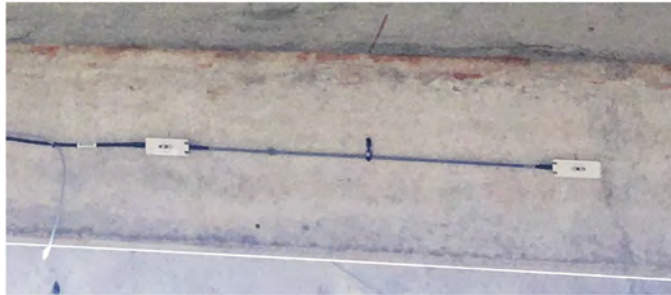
Optical Strand set under one of the main beam girders of a prestressed concrete viaduct.
